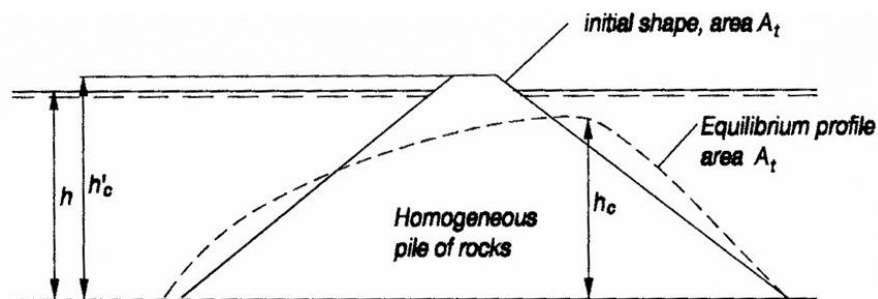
Typical Reef Breakwater Showing Initial and Deformed Cross-Sections.
